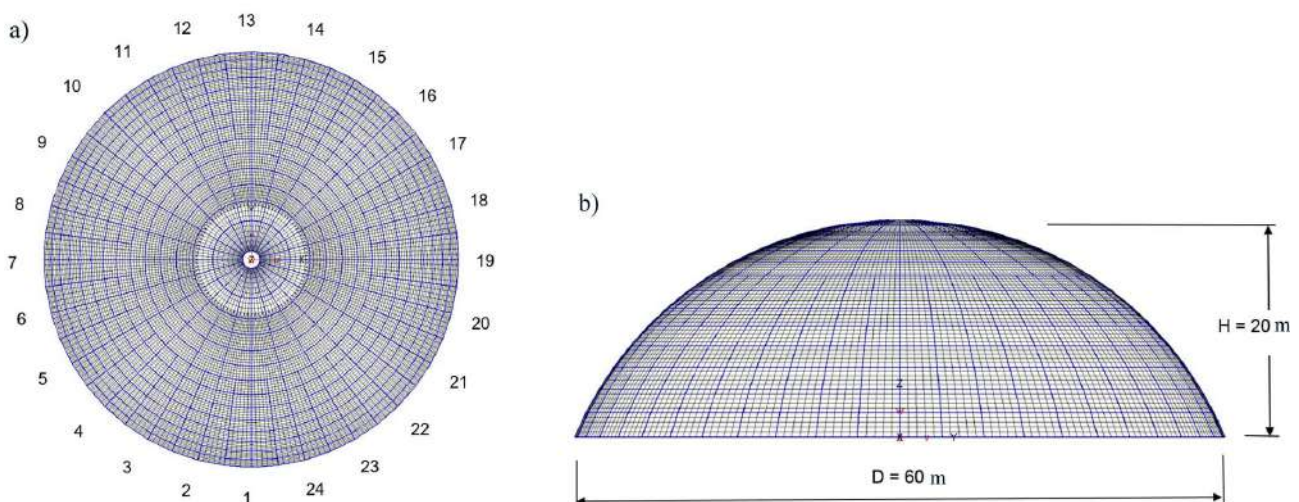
Scheme of ribbed ring dome: a) plan; b) facade.
